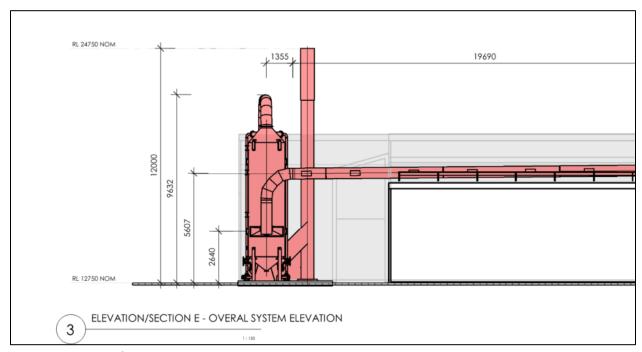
Elevation/ Section of proposed flue (Source: Watch This Space Design, 2025)
